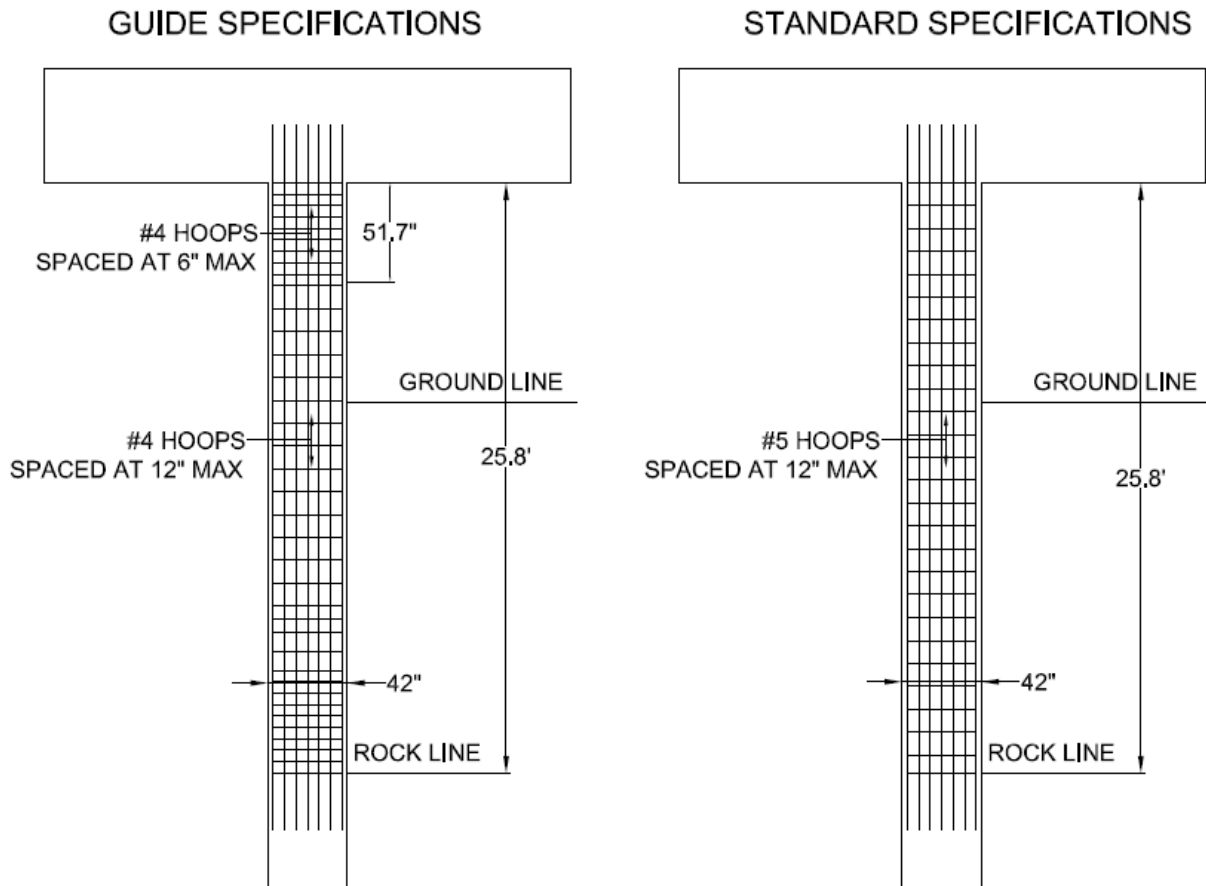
Oseligee Creek Bridge Bent 3 Final Design Details (SDC A2)
